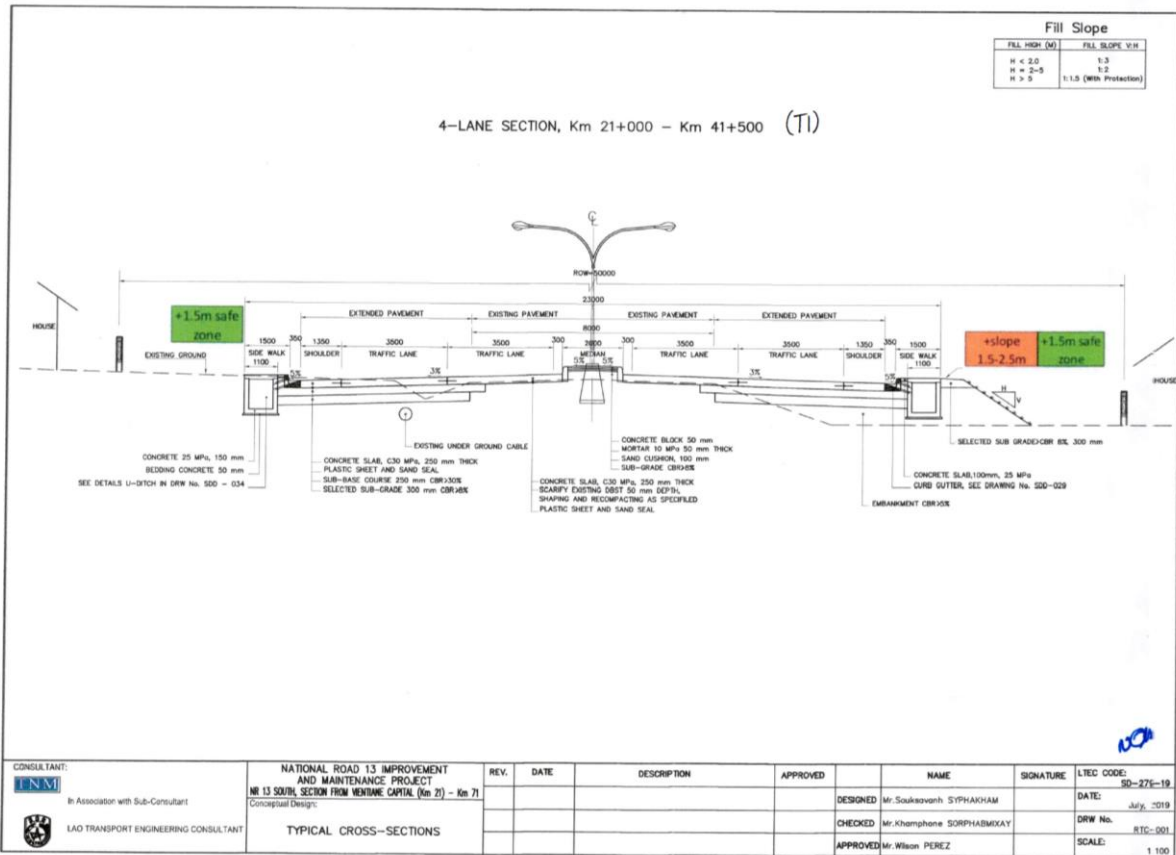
Typical Cross-Sections of 4-Lane Section (T1)
